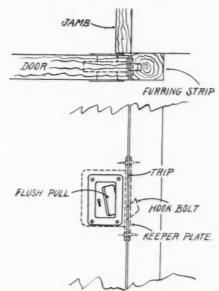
Elevation and Section of Mortise Type Garage Lock.
